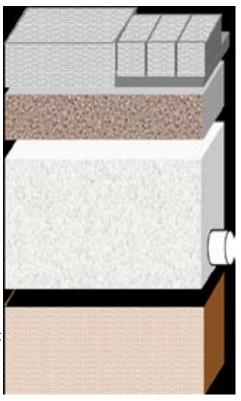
Types of materials used in infiltrating and closed pervious pavement systems.
